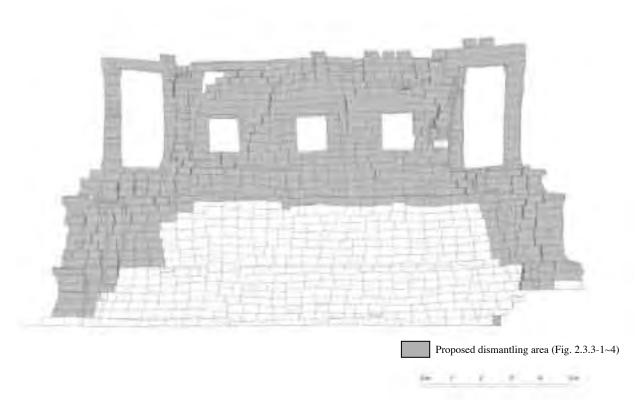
Southern Library of Bayon, North Elevation.
